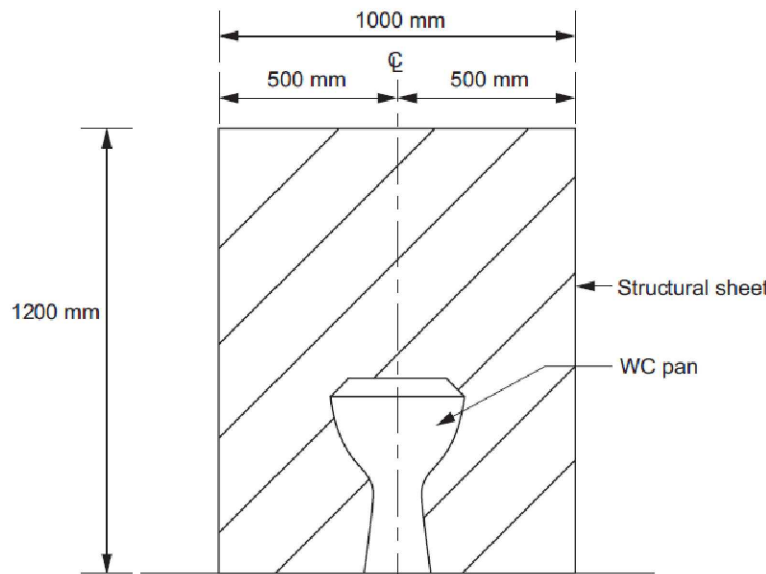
Location of sheeting for a wall behind a toilet pan
